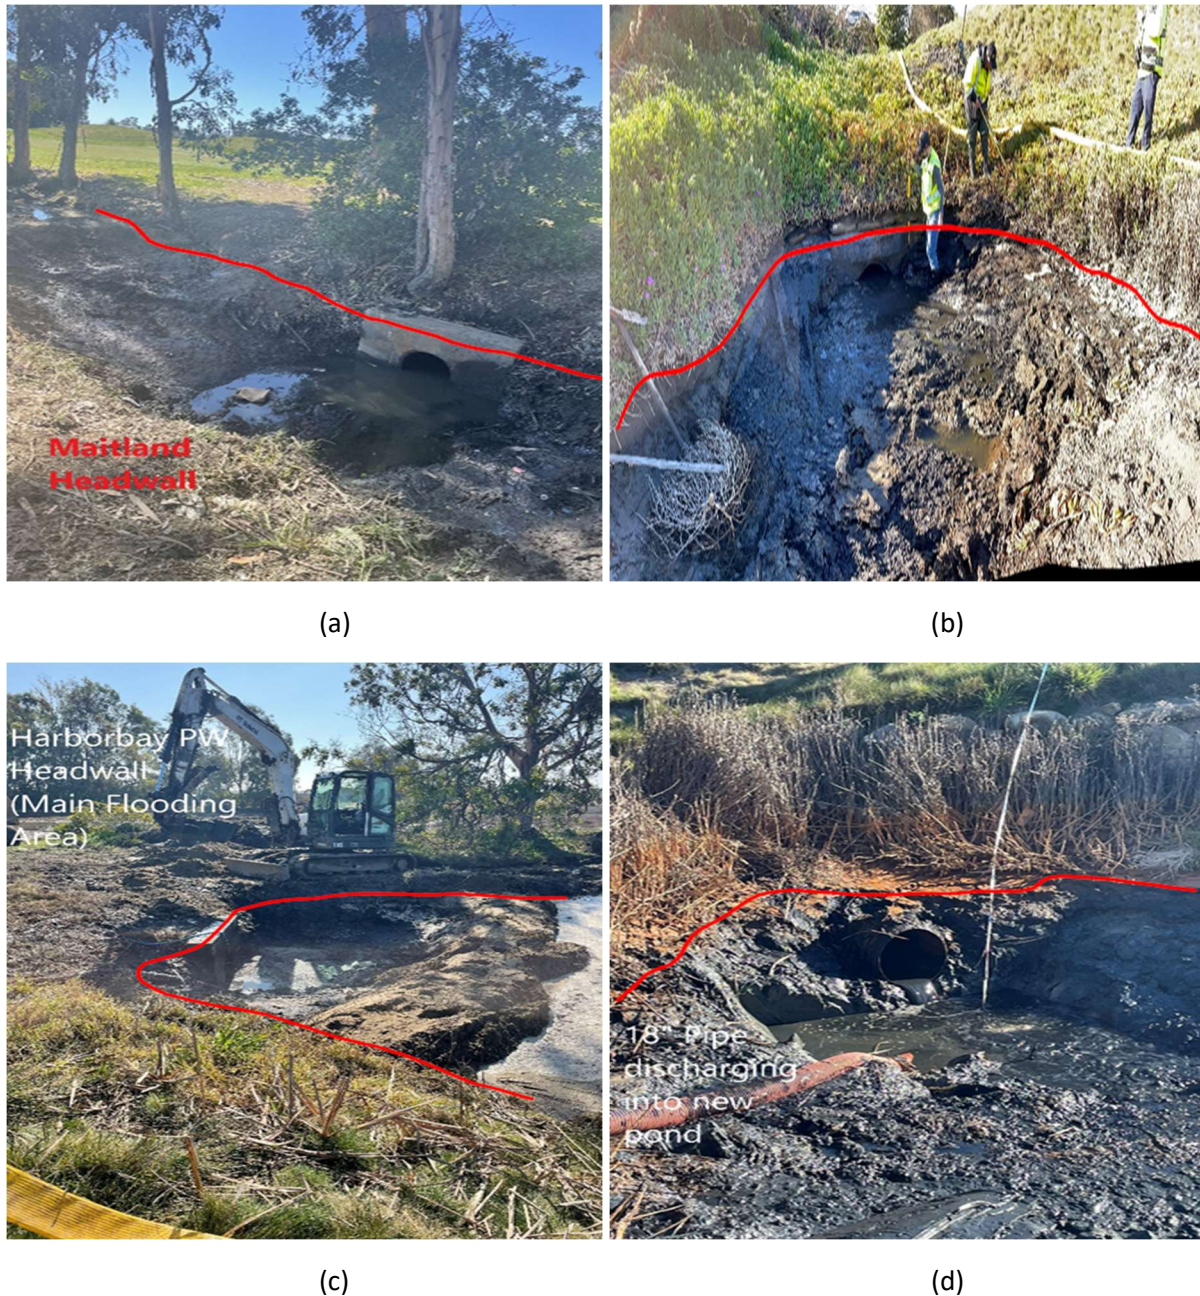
Images of Storm Sewer Outfalls Blocked with Sediment (Red Line Shows Approximate Level of Sediment Prior to Excavation)
